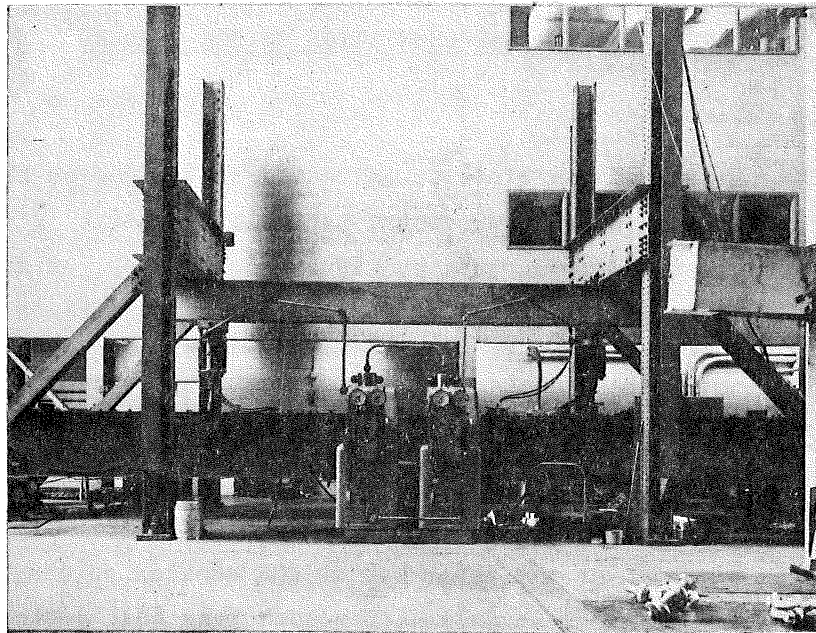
Test Setup Viewed from South Showing Loading Frame, Amsler Pulsators and Hydraulic Jacks and Girder 3
